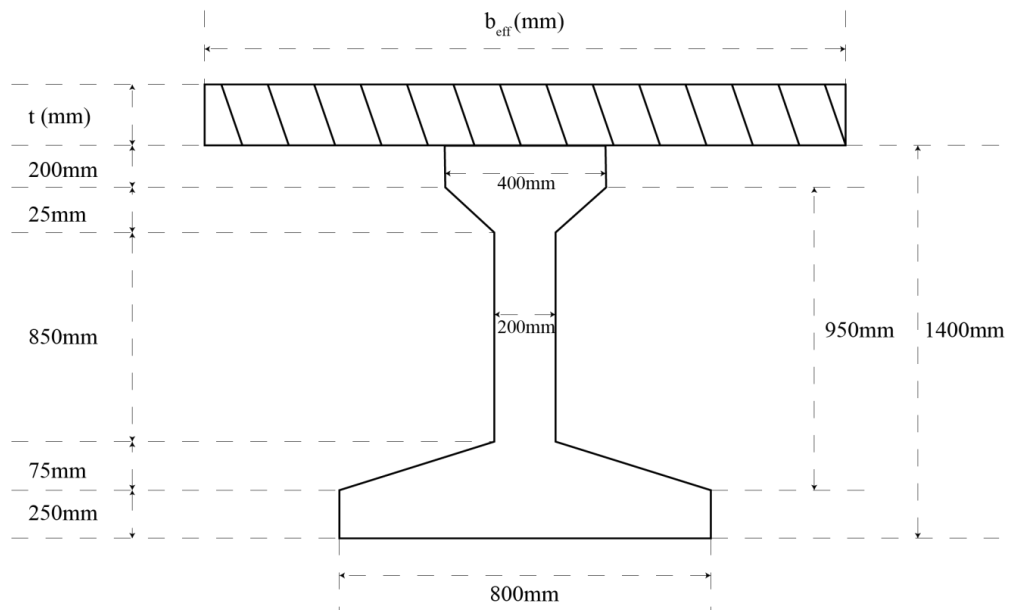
The cross-section highlighting the composite girder and slab structure
